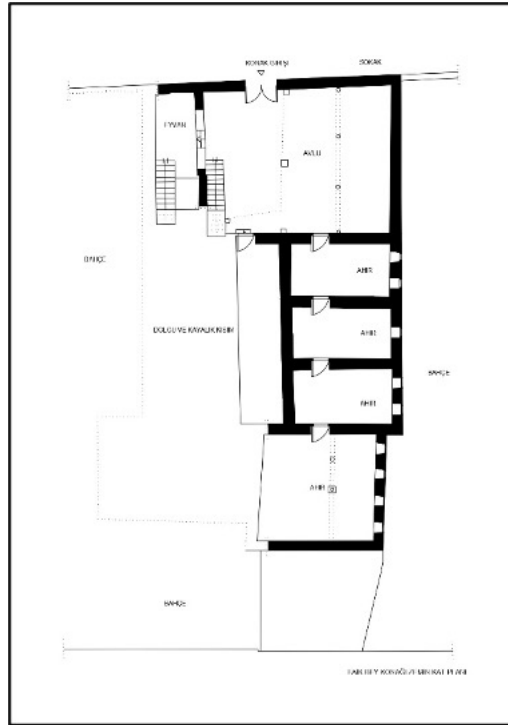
Faik Bey Mansion Ground Floor Plan[7]
